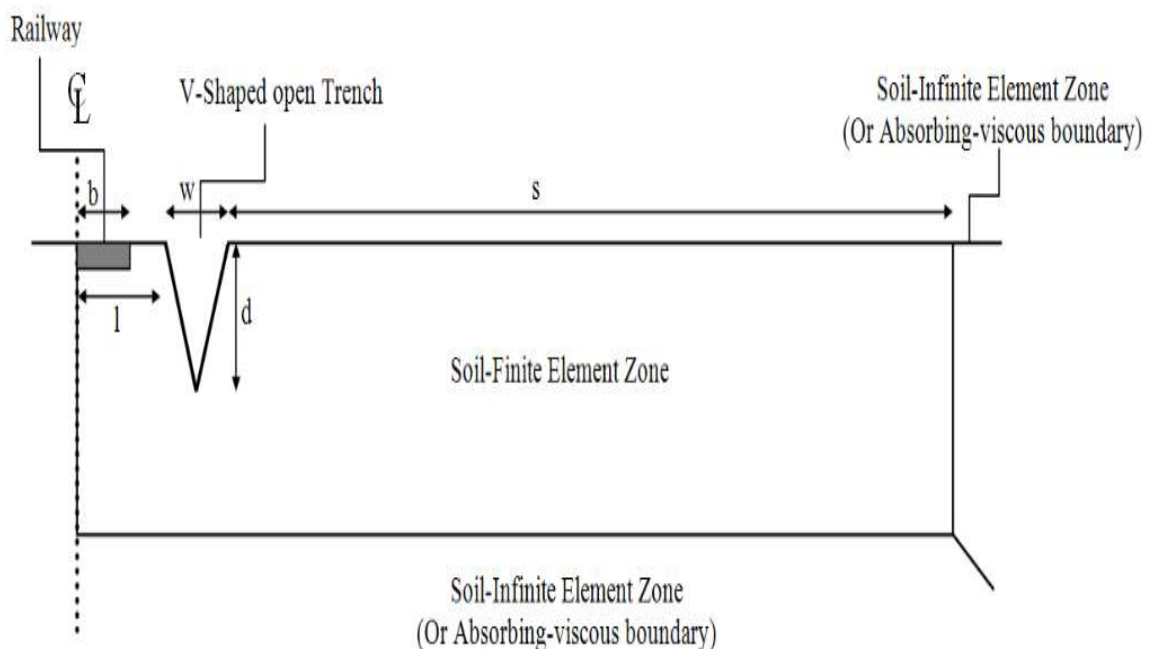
V-shaped trench (Esmaeili et al., 2014)
